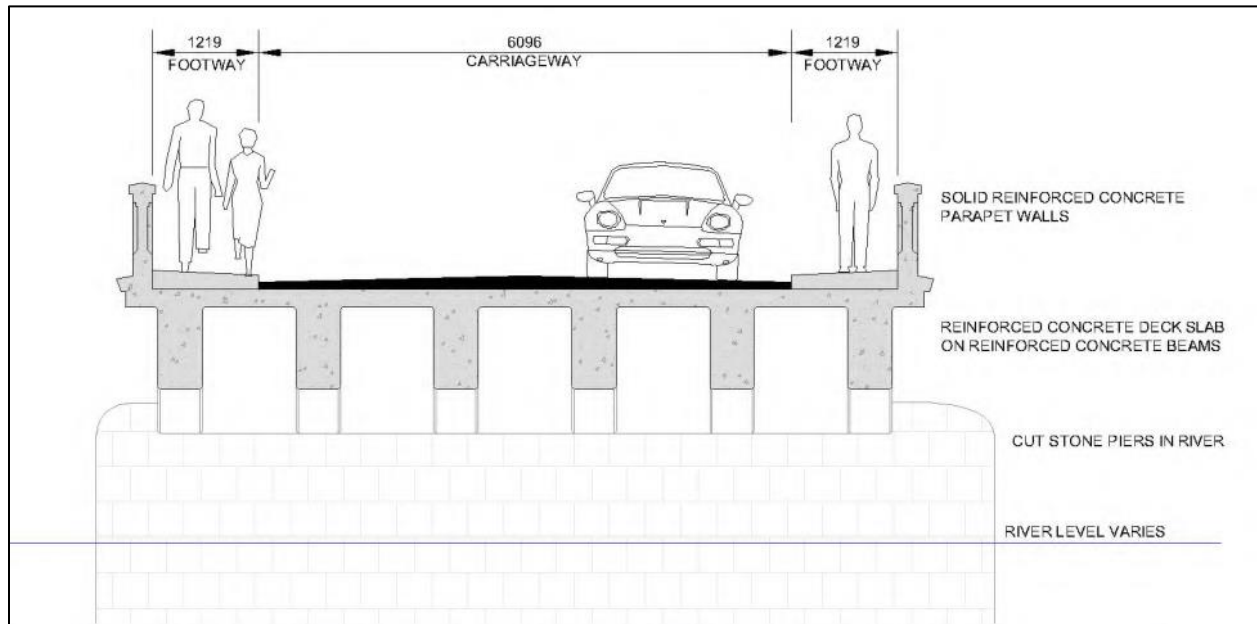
Wolfe Tone Bridge Original Layout⁴
